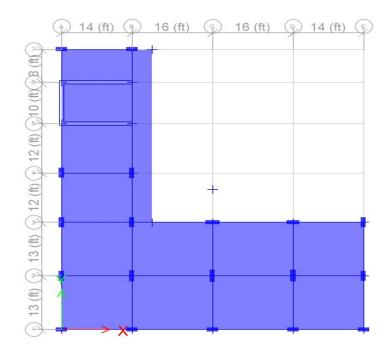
Plan view of (G+12) storied commercial building Plan 04
